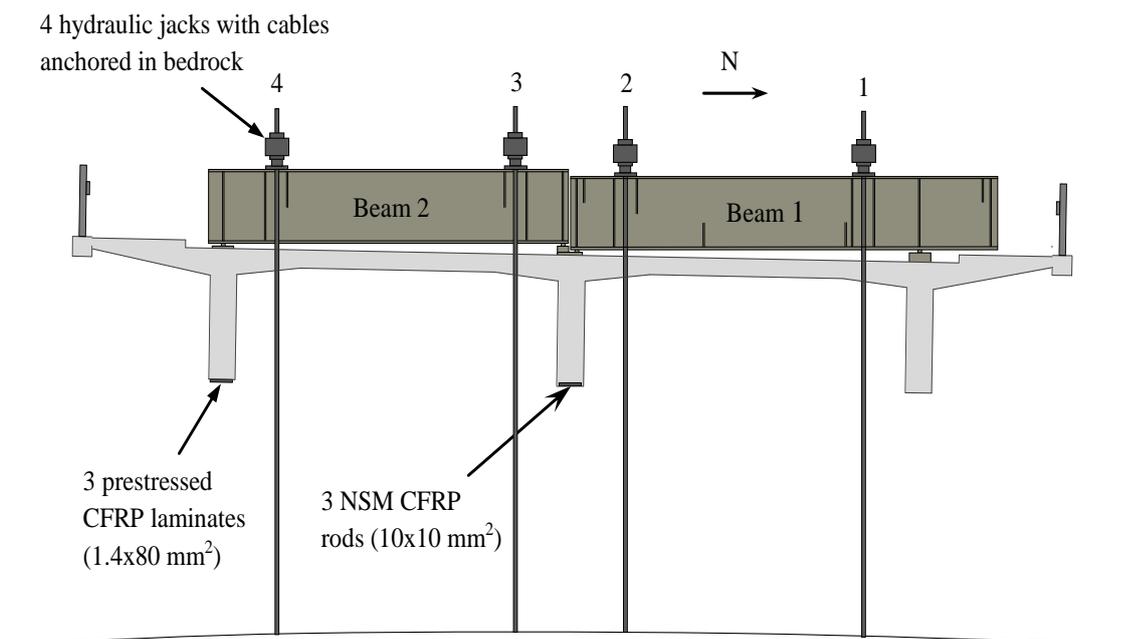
Arrangement for loading the bridge girders in midspan 2-3.
